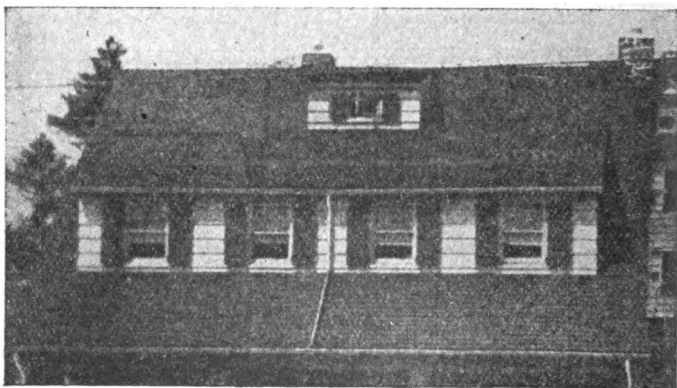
Roof Drainage of a Country Home. Type of Roof Determines Gutter Size
